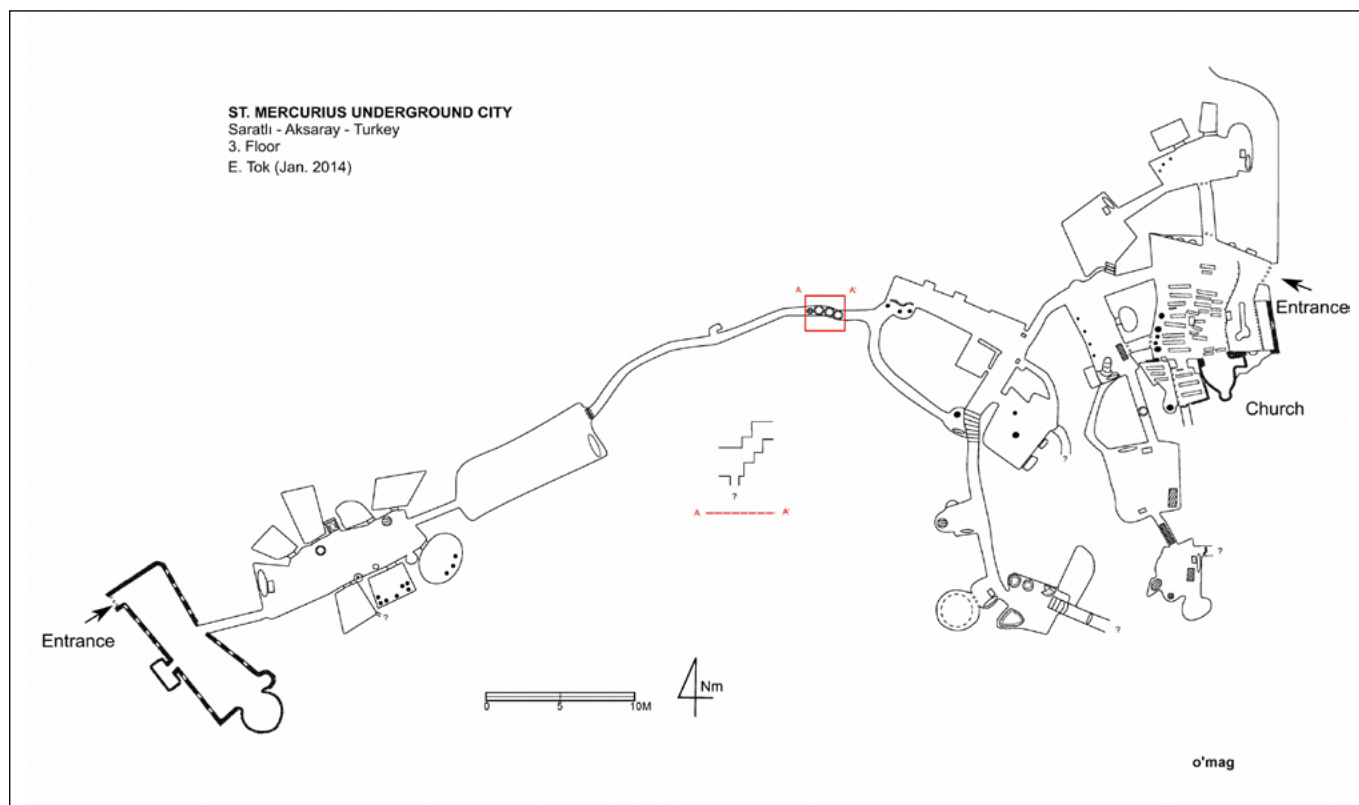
plan of St. Mercurius Underground City, 3. floor (drawing E. Tok).
